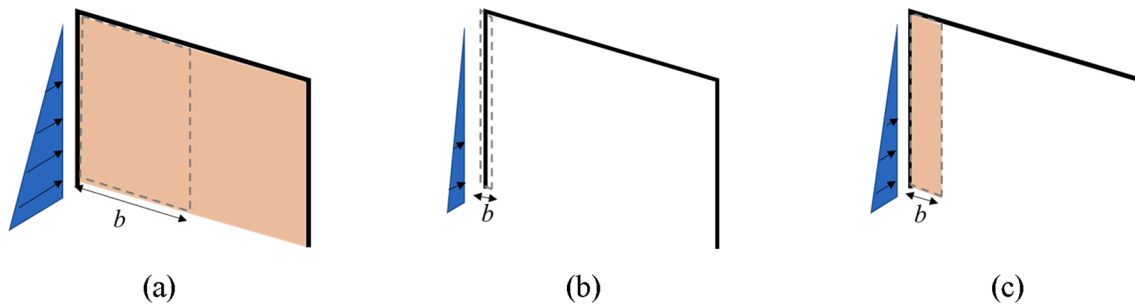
Impacting surface for the calculation of drag forces on columns: (a) infill walls still standing, (b) infill walls totally broken away and (c) infill walls/partitions broken away with remaining parts of masonry attached to the surrounding frame.
